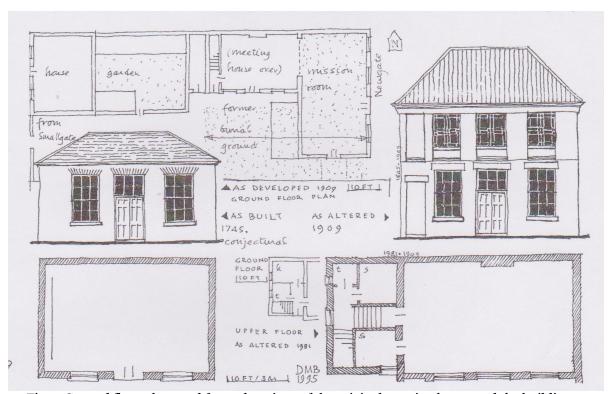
Ground floor plans and front elevations of the original meeting house and the building as enlarged in 1909. (Butler (1999) vol.2, p.569)
